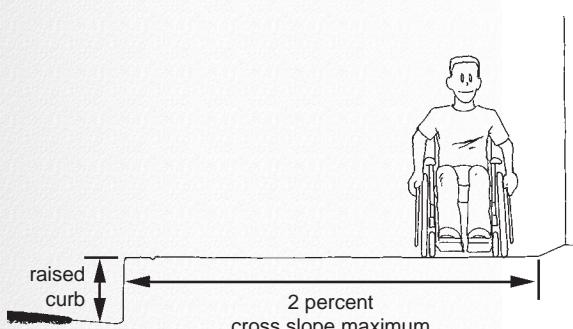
ACCEPTABLE DESIGN: Increasing the height of the curb provides a level pathway when the street elevation is lower than the building elevation. This solution is not ideal because it is more difficult to install well-designed curb ramps at corners with high curbs.
